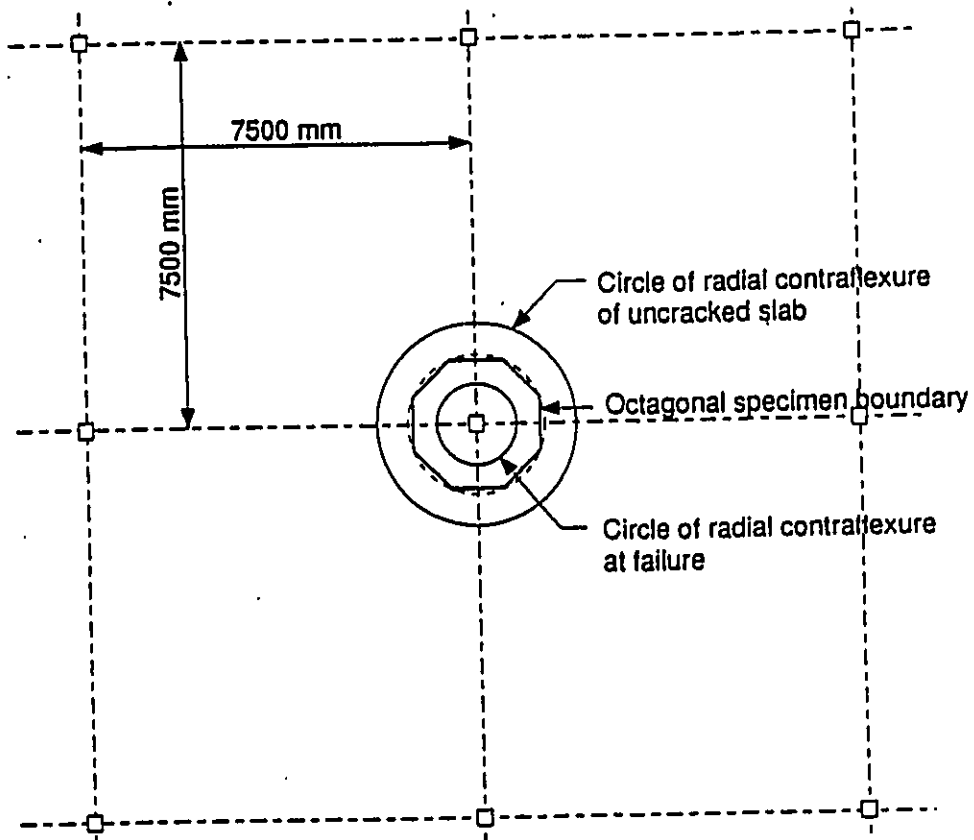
Plan of slab showing specimen location (Rahman 1991)
